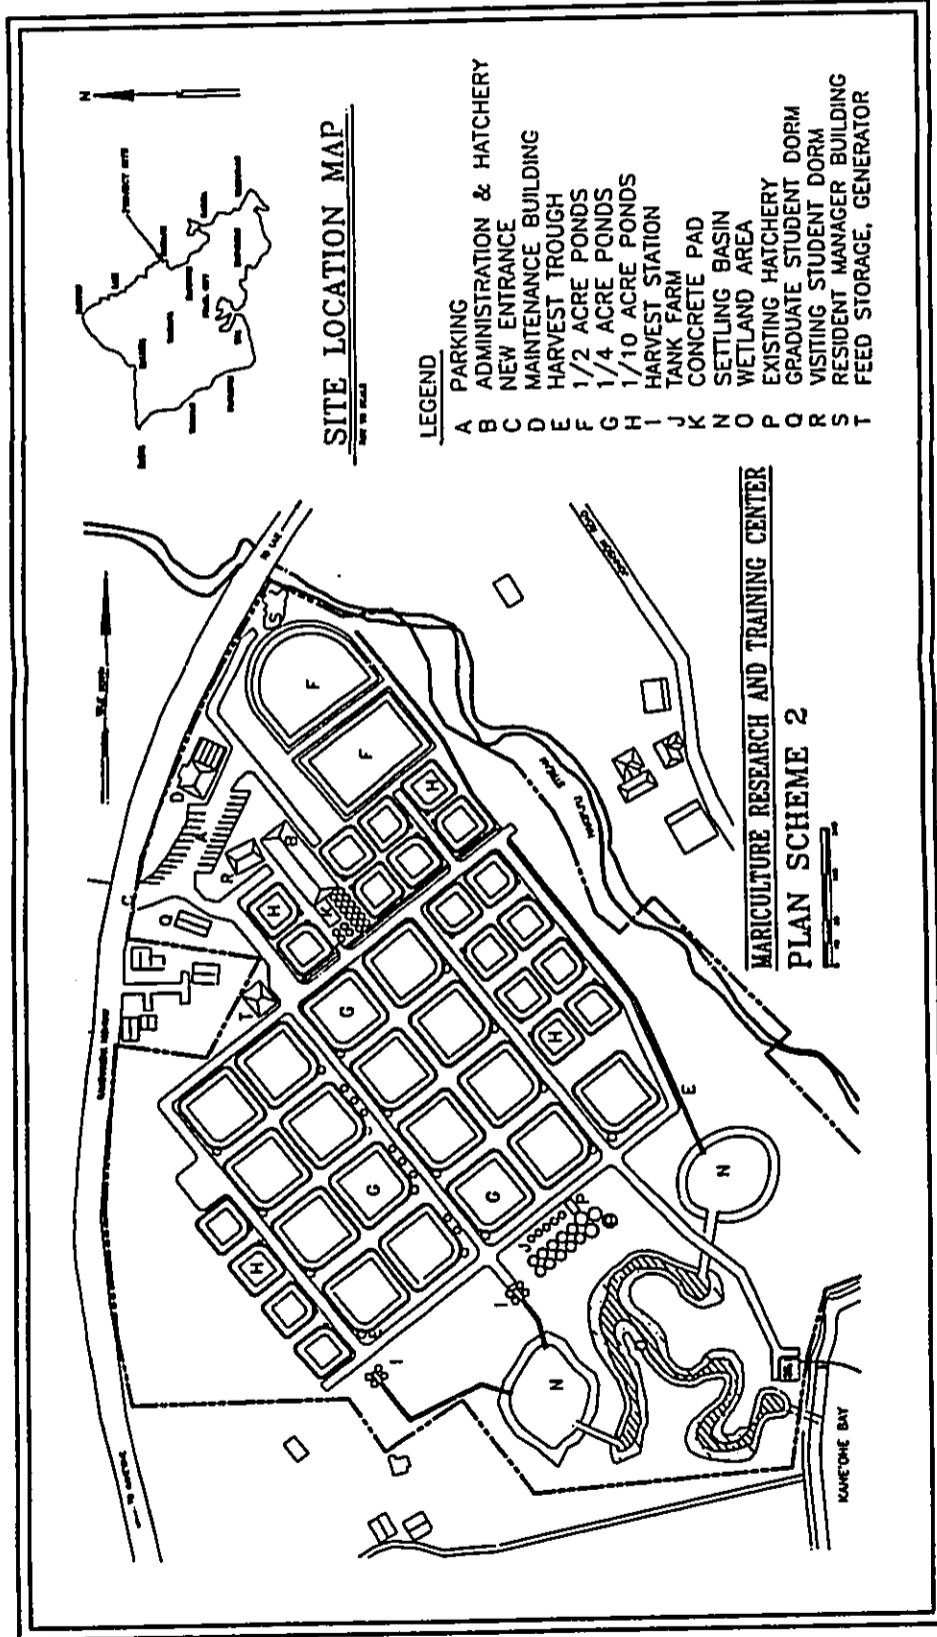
FACILITY LAYOUT - SCHEME 2
